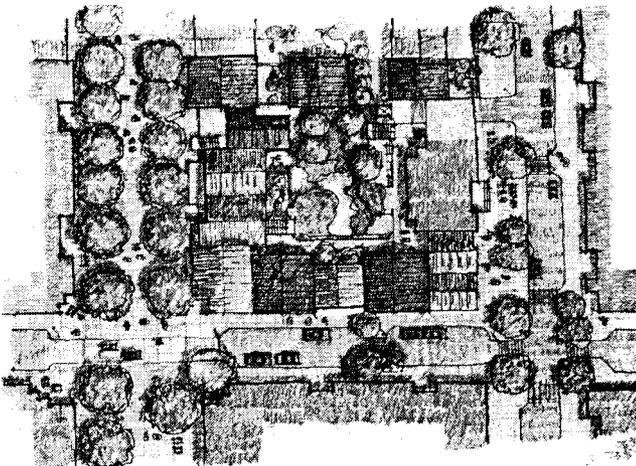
Residential section and plan with alternating pedestrian greenways and vehicular access streets and new and existing external densification.
